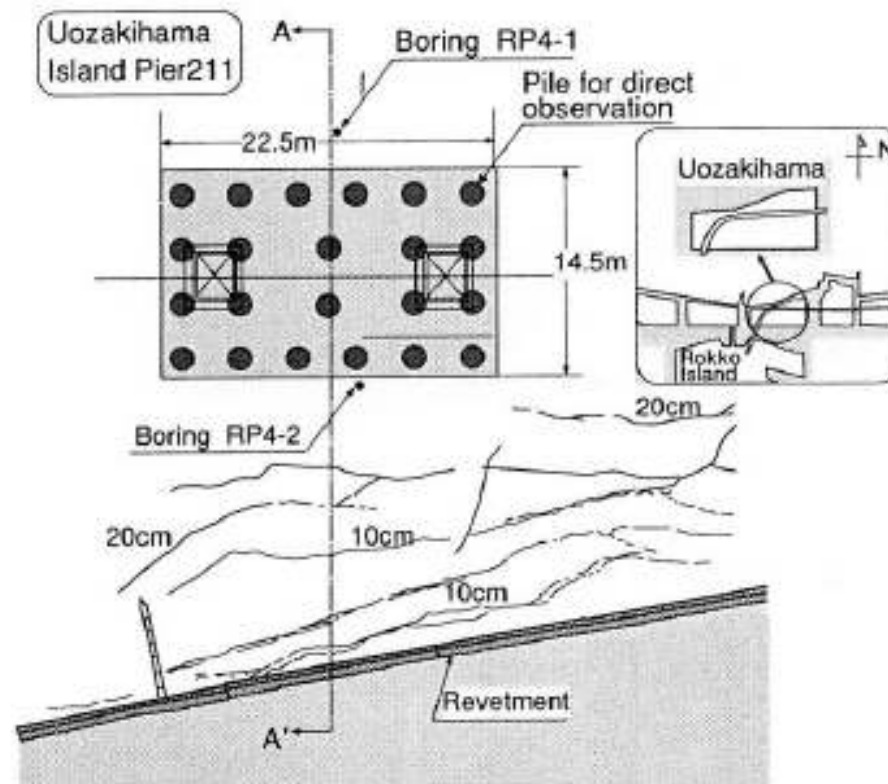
Damage Survey of Piles, Uozakihama Bridge (Ishihara, 2003)
